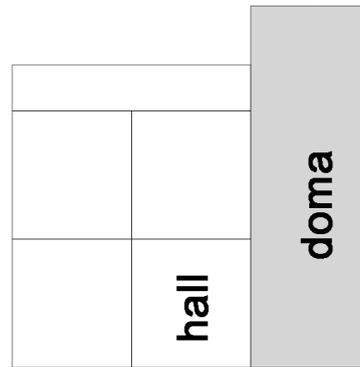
Typical plan 2 (Shimizu old residence)
